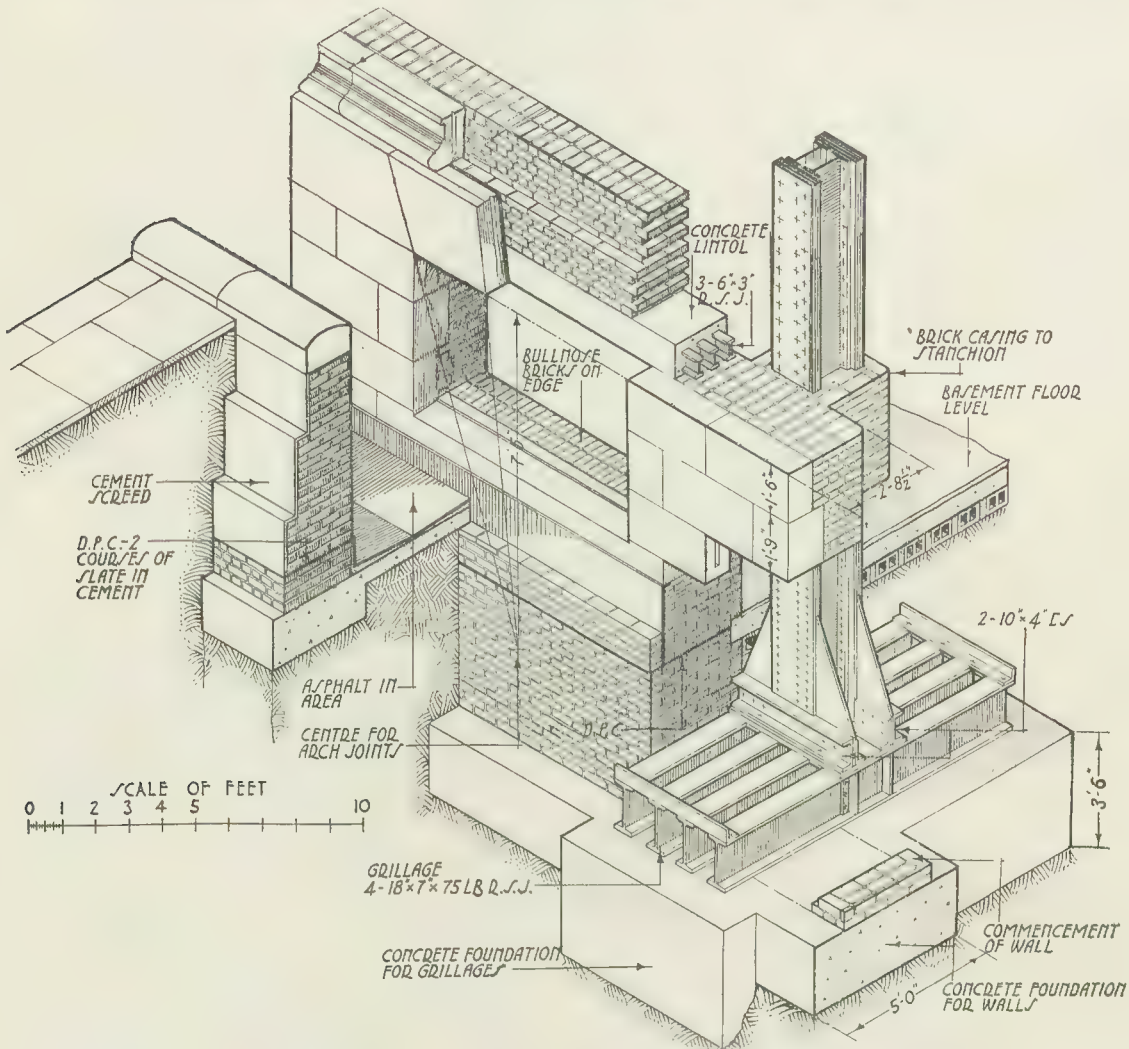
GUSSET TYPE OF STANCHION BASE AND STEEL GRILLAGE FOUNDATION
